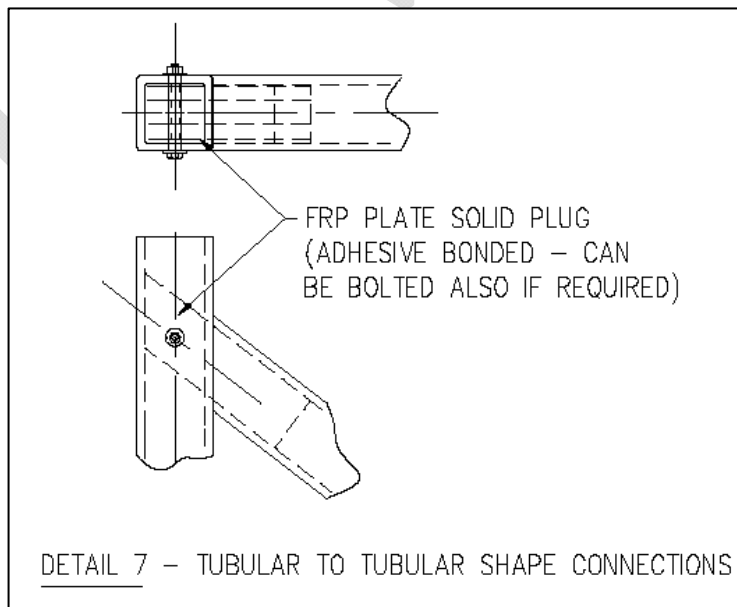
PULTRUDED FRP STRUCTURAL CONNECTIONS
